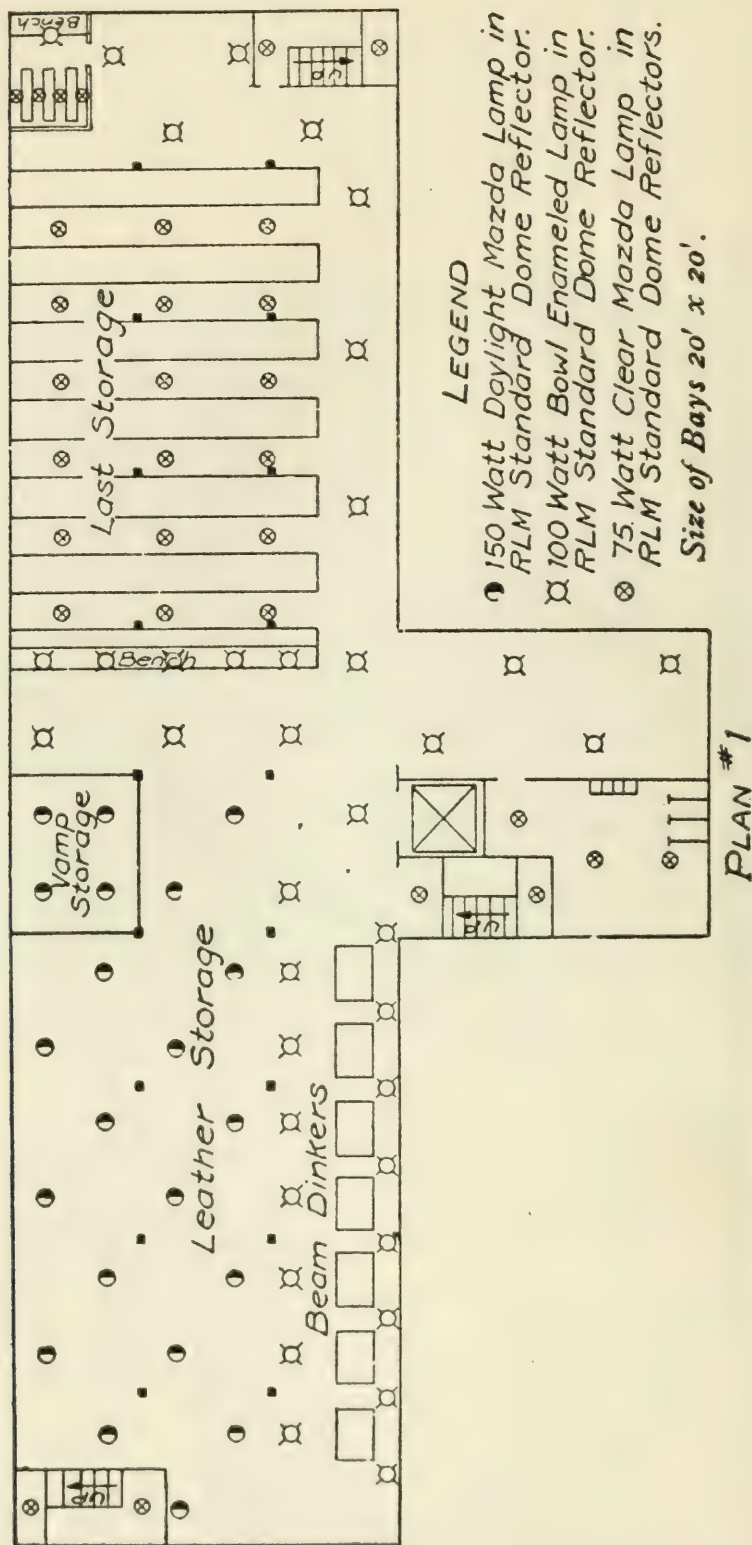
Model shoe factory, basement floor plan, storage and sole leather department.
